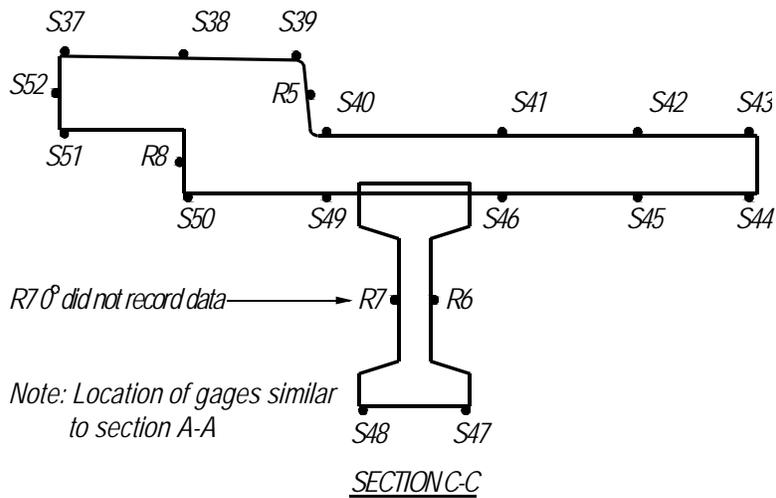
X7 instrumentation at plane C-C (centerline of span)
